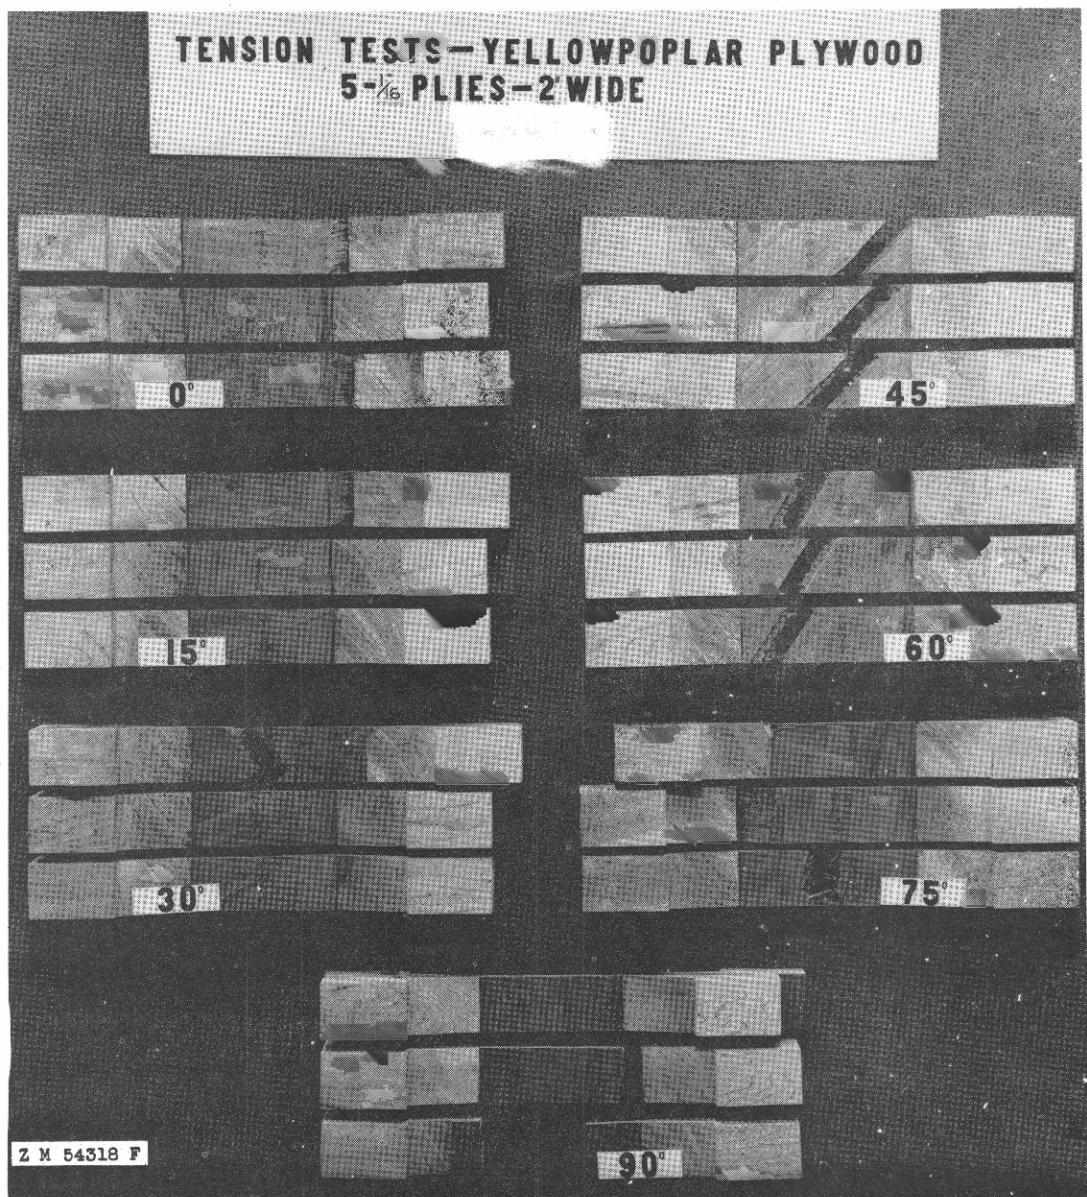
Types of failure in tension tests of yellowpoplar plywood made of five 1/16-inch plies, 2 inches wide.
